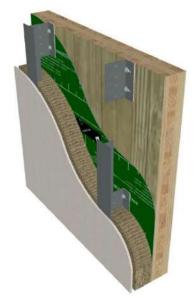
CLT wall build-up with wrap, steel battens, insulation, and cladding/lining [5].
